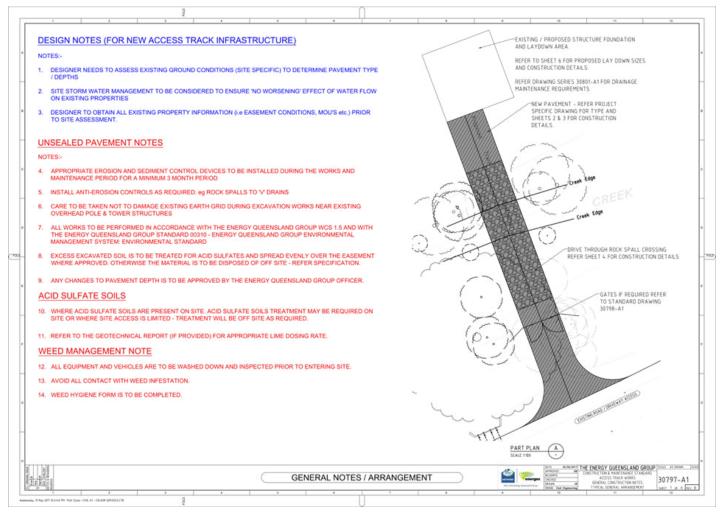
Access Track Infrastructure – General Notes and Typical Arrangement.
